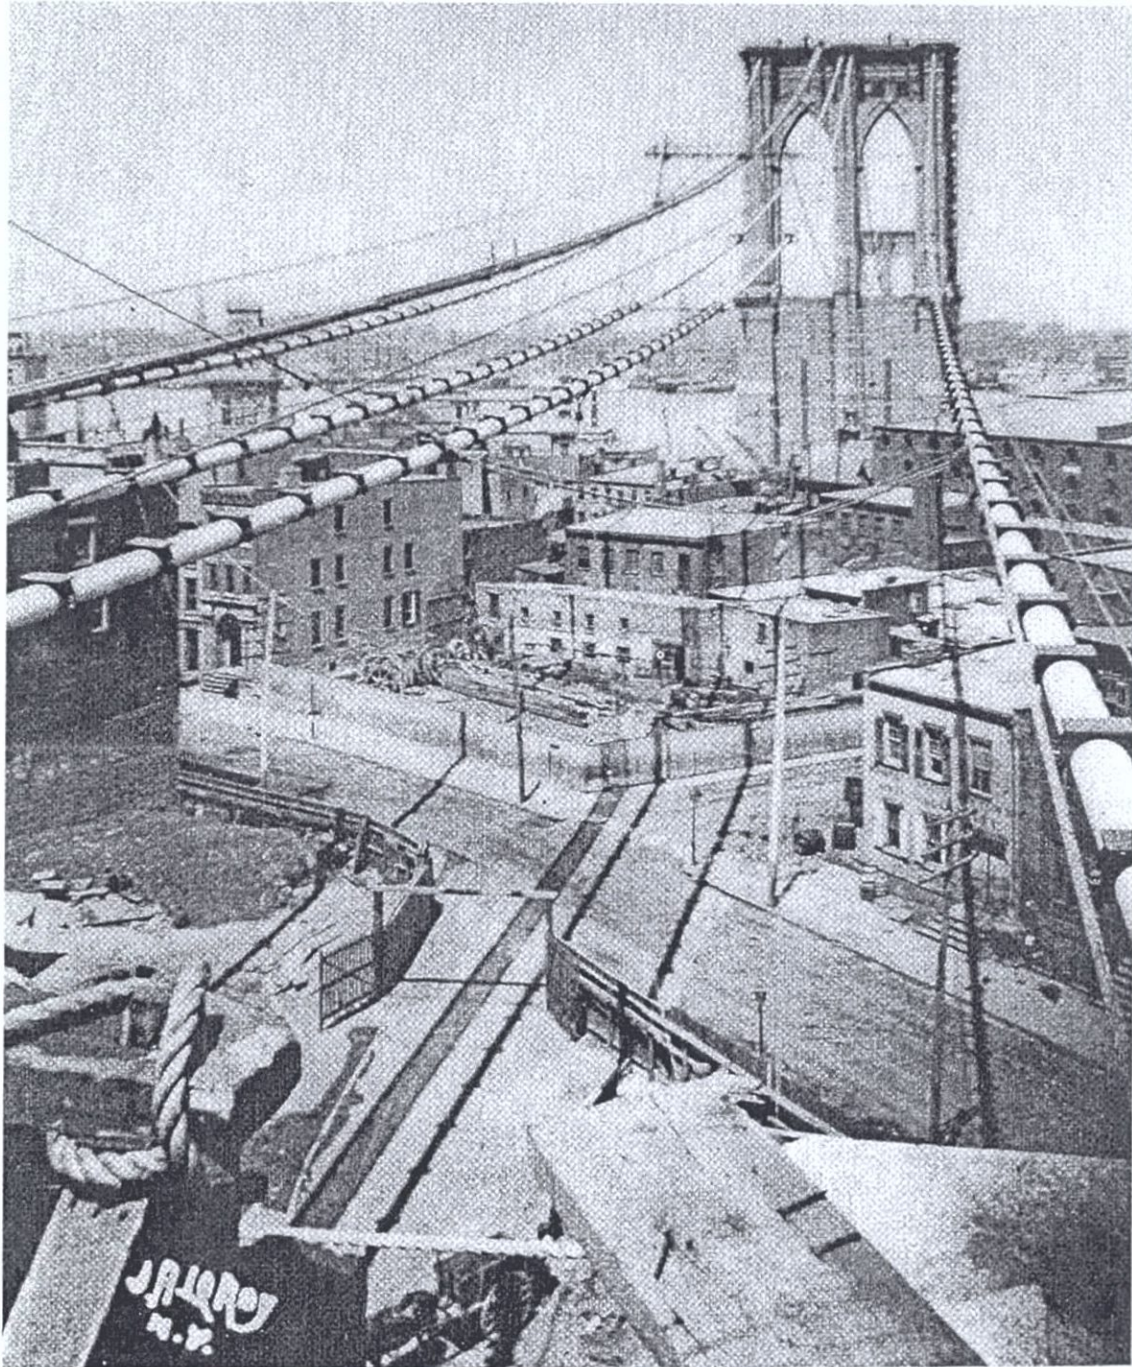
Photograph Taken During Construction of the Brooklyn Bridge, 1877 (Shapiro 1983).
